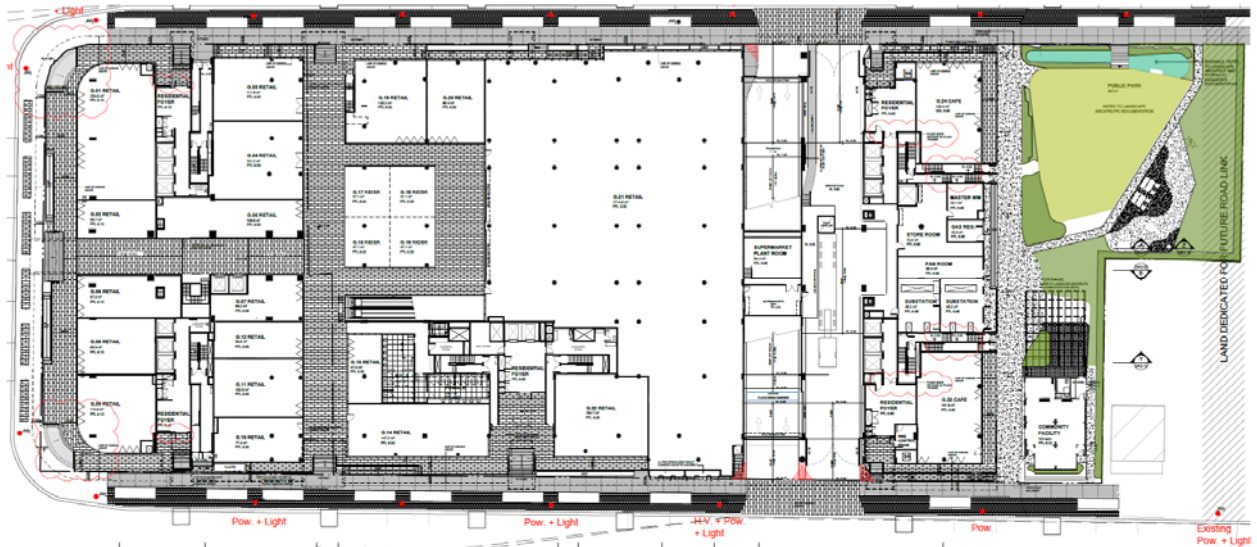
Proposed ground floor plan under DA/961/2015/B Source: Team2 Architects, Issue I-b, dated 14 December 2018
